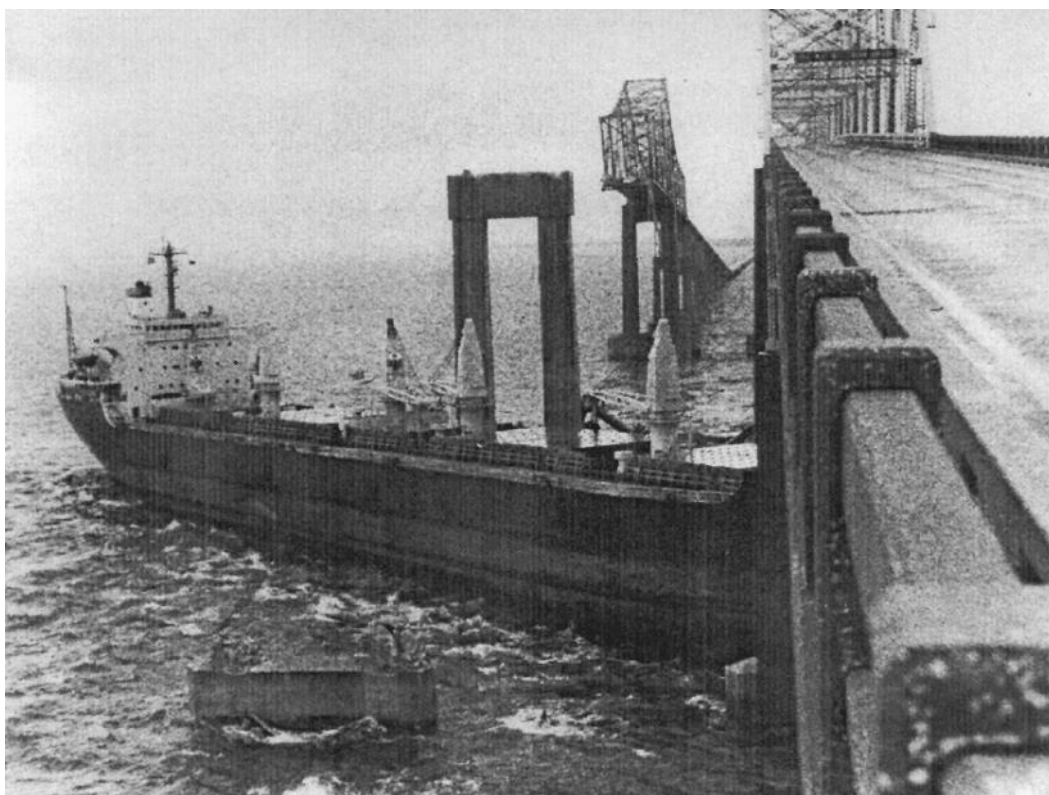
View of the collapsed western span of the Sunshine Skyway Bridge, looking to the north.
